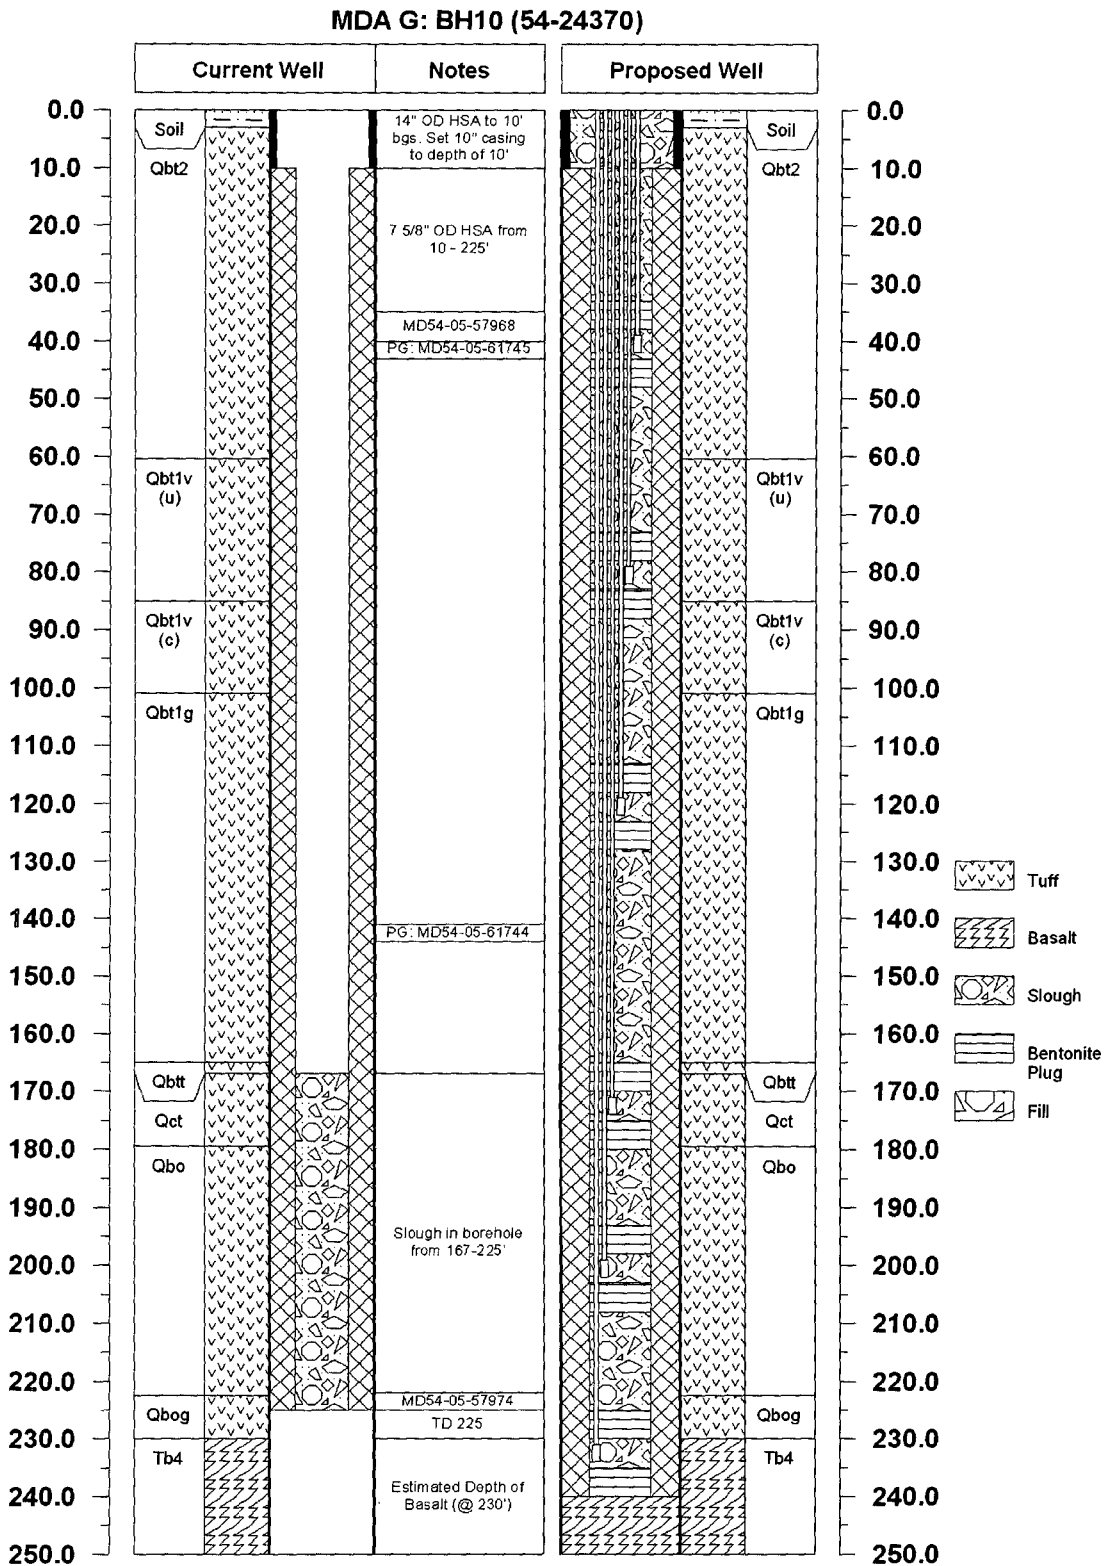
Detail of proposed borehole construction for BH-10, 54-24370
